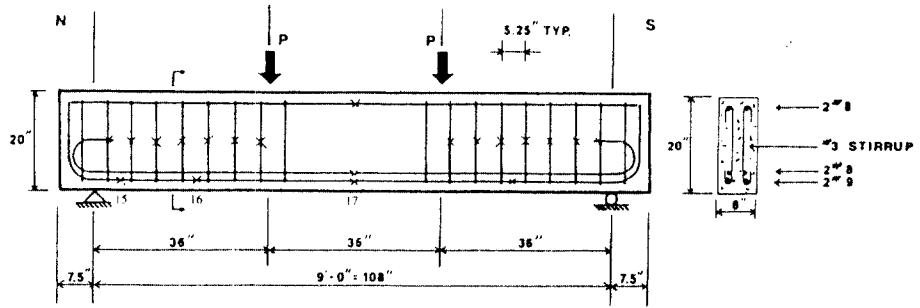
Test Specimen of the Reinforced Concrete Beam
